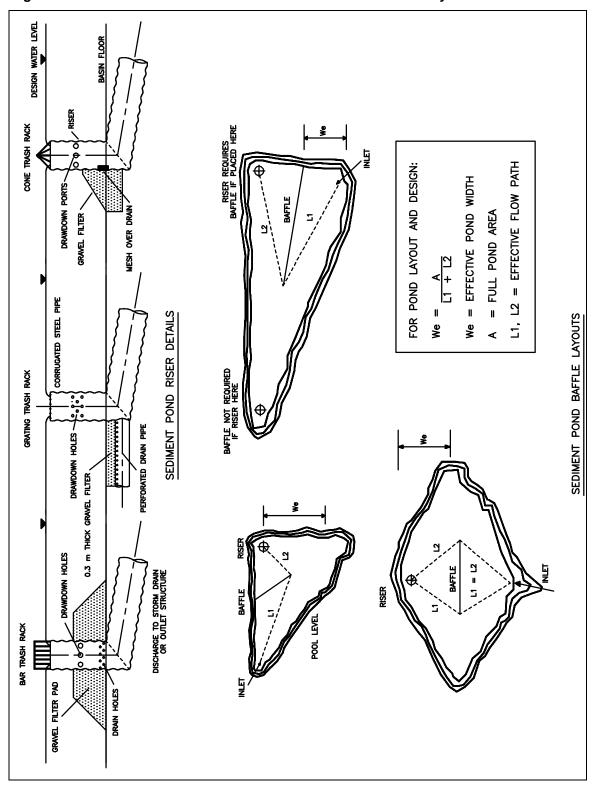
Sediment Control Pond Riser Details and Baffle Layouts
